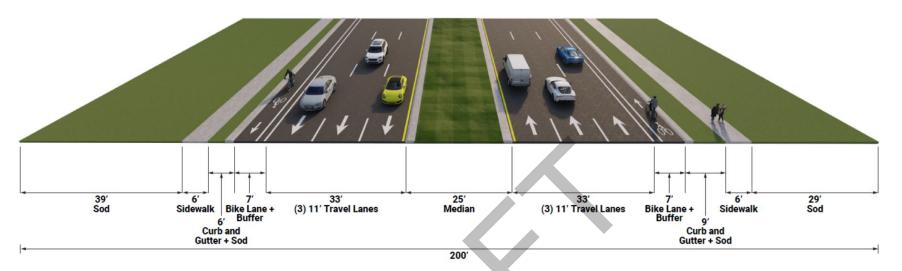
US 41 – Foley Road to Springs Plaza/Access Road
